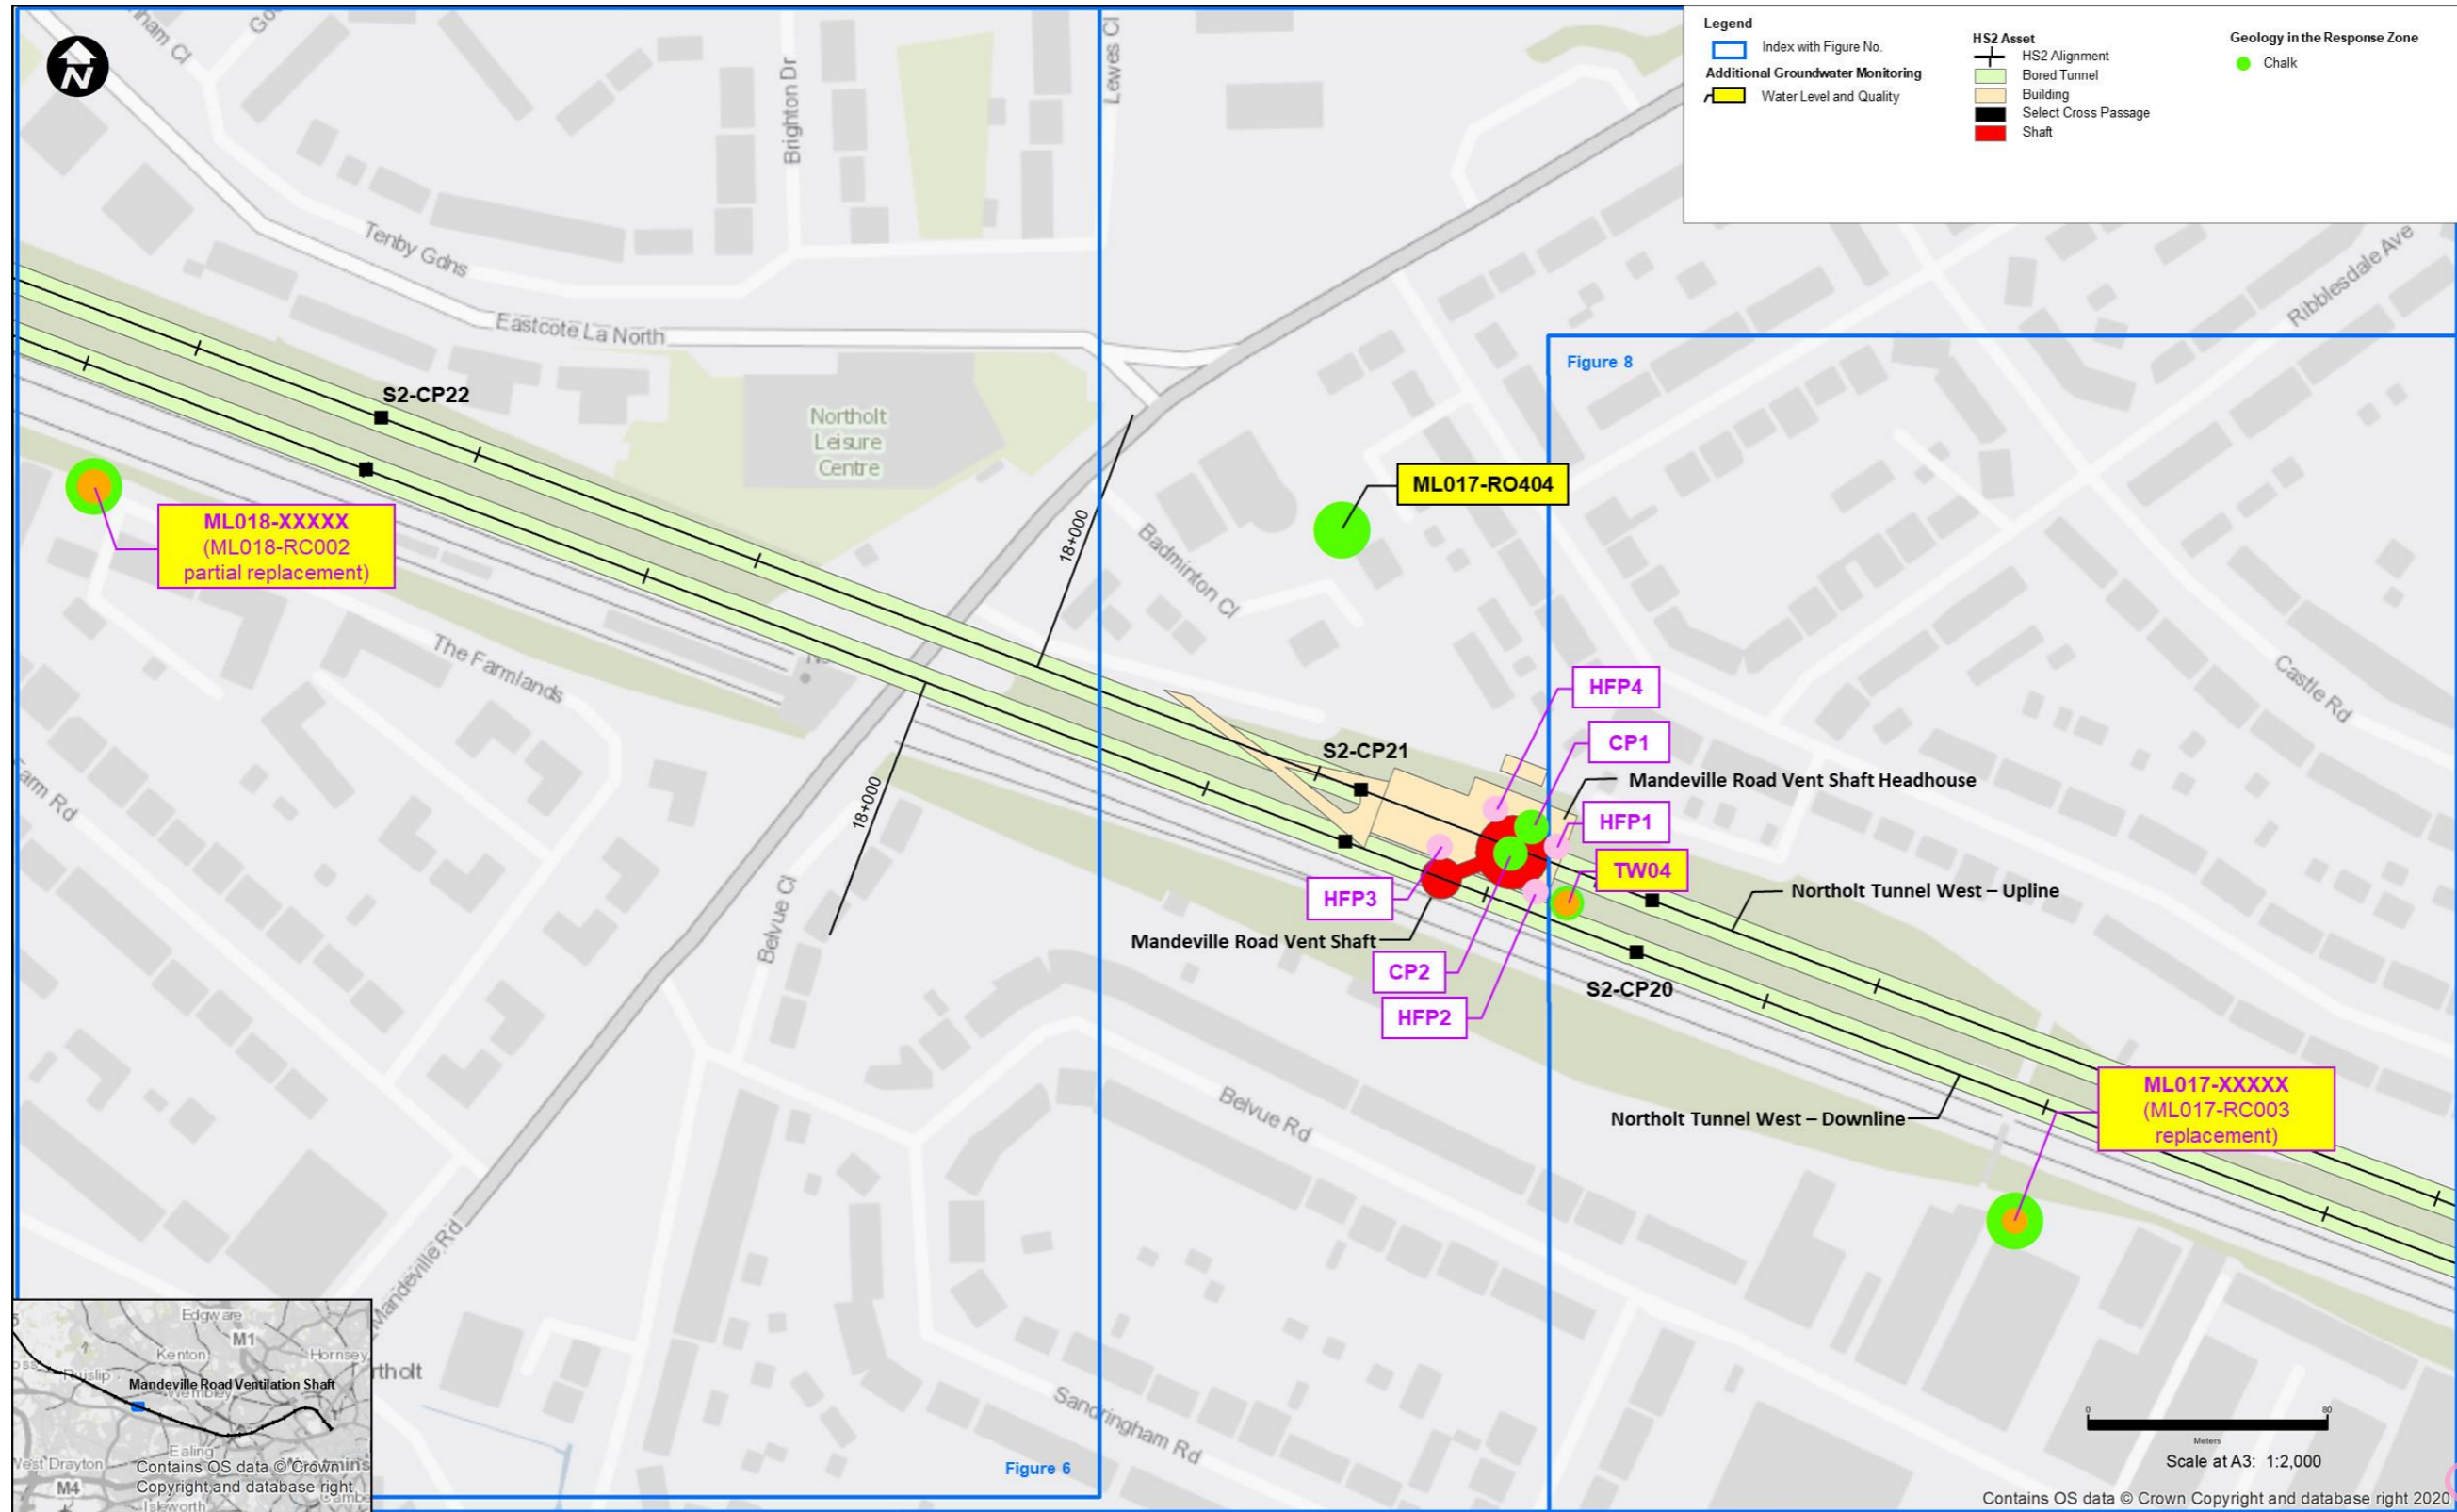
Groundwater Monitoring Plan - Mandeville Road Ventilation Shaft
